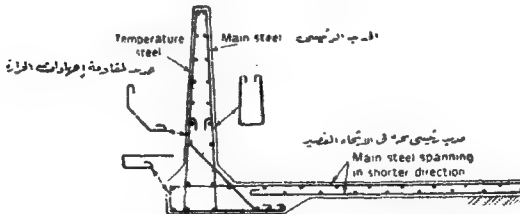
Swimming pool wall قاع حمام سباحة
